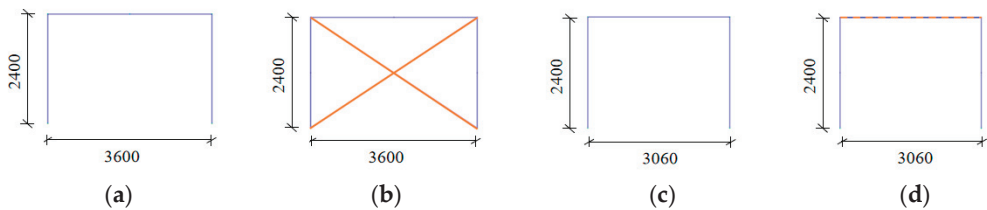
Finite element models of one-story one-span frame structures. (a) K1-1 (b) K1-2 (c) K2-1 (d) K2-2.
